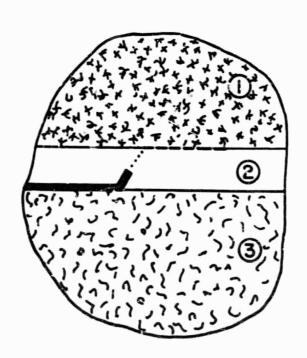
CRACK PROPAGATION IN A TECHNICAL JOINT
